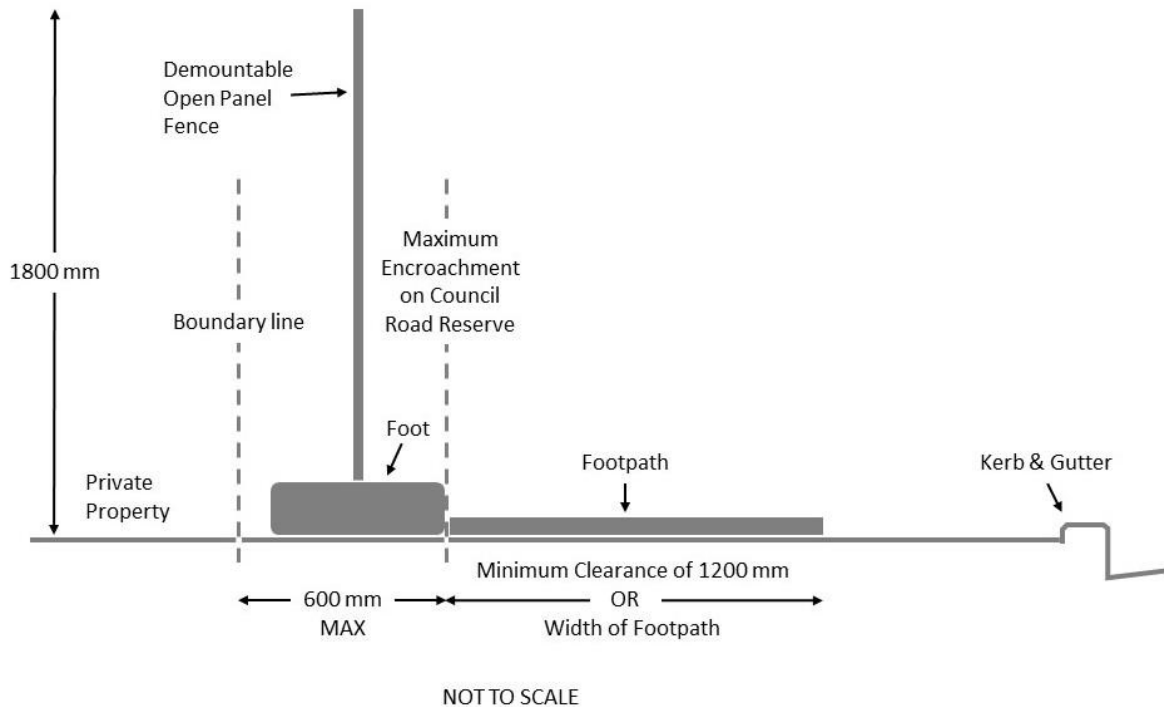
Typical Low Risk Type A Hoarding Section/Detail
